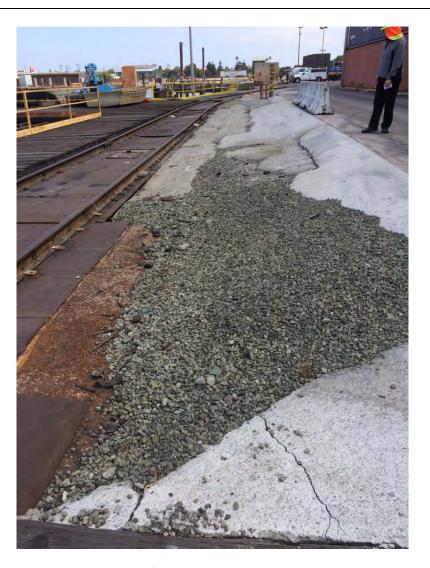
Looking north, surficial cracks and areas with sparse gravel coverage; area will be modified to have combination of gravel and concrete cap.
